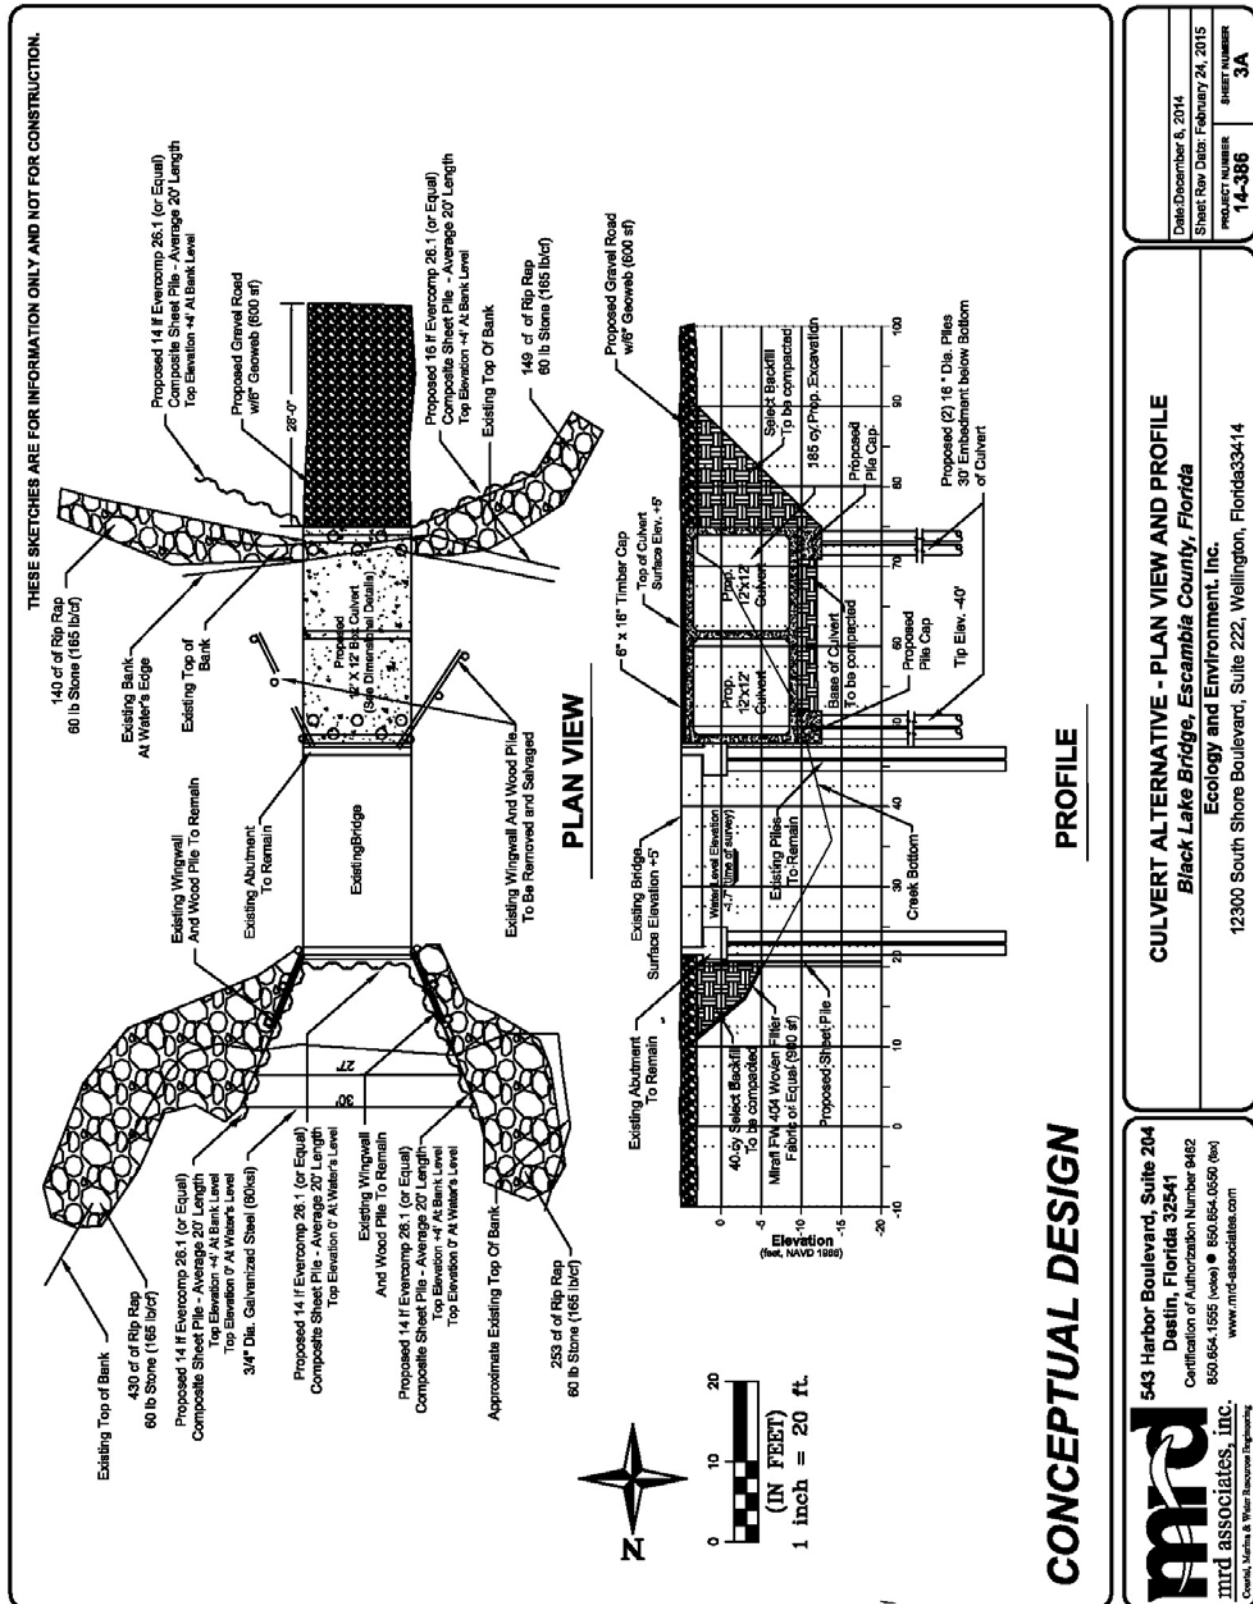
Alternative D – Install large concrete box culverts and protect abutment plan and profile view.
